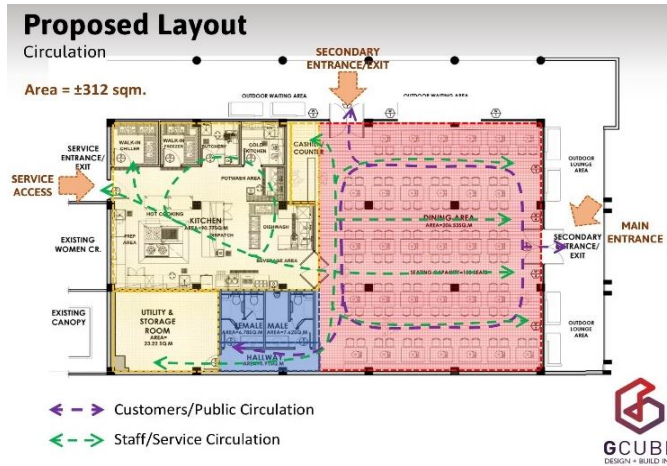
Circulation Plan for Proposed Restaurant Layout.<sup>29</sup>
